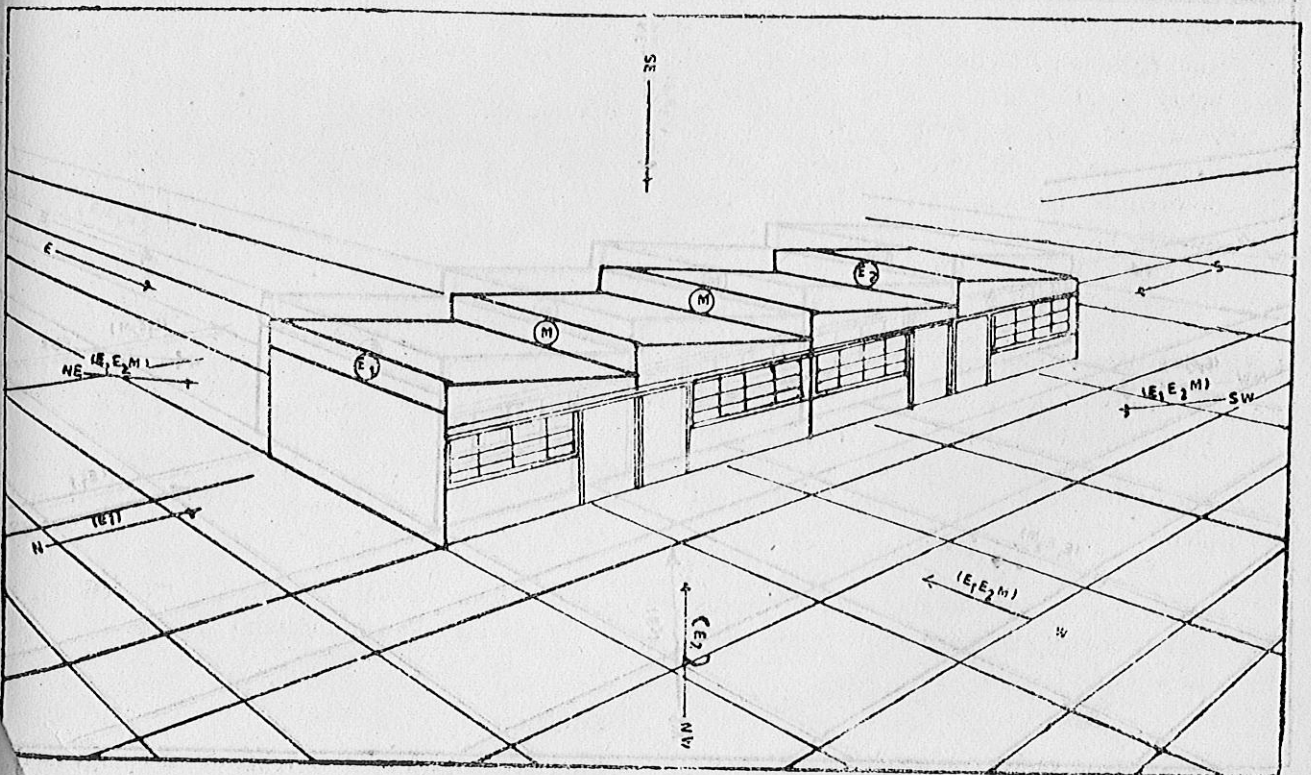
Preferred Location of Roof Openings in Northlight Sheds Having Windows on West Wall Only.
